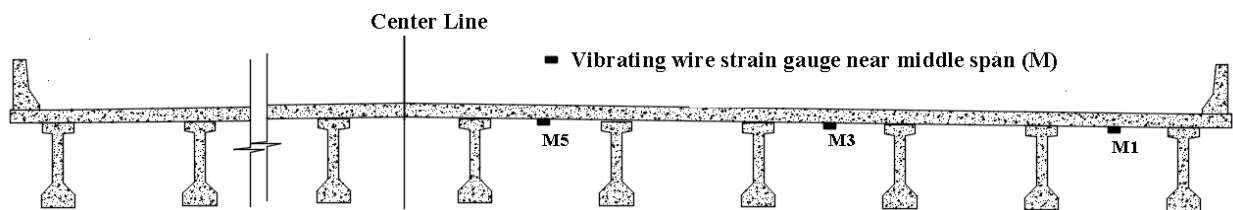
Instrumentation layout in middle-span section for long-term testing (first span)
